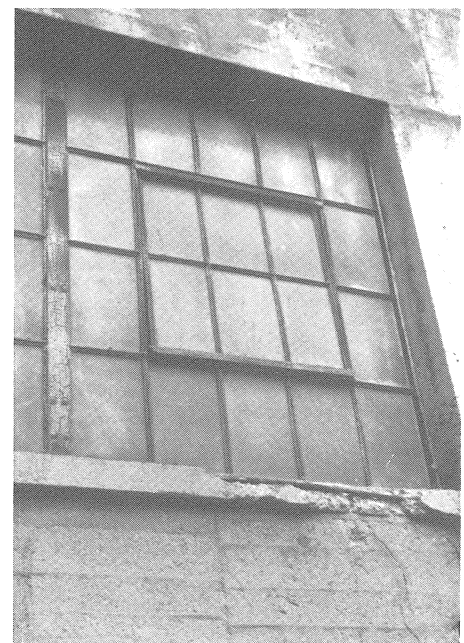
Due to lack of maintenance, severe rusting of the steel frames had occurred, which contributed to the spalling of sections of the concrete sills, jambs, and spandrels. Photo: Charles Fisher
